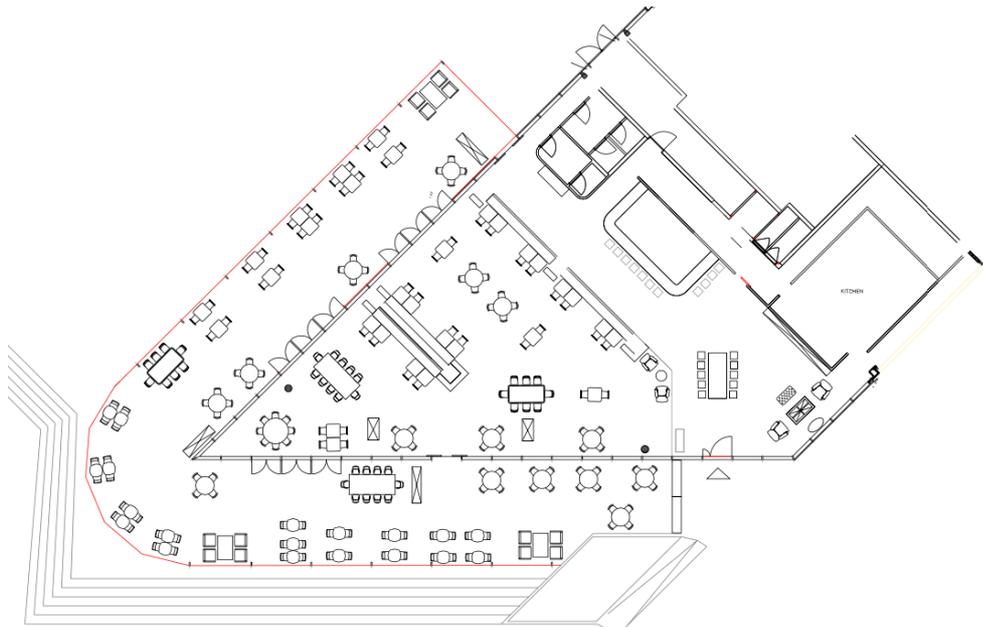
Layout plan of Big Chefs, One Tower (Drawing by Tilbe Korucuoğlu)
